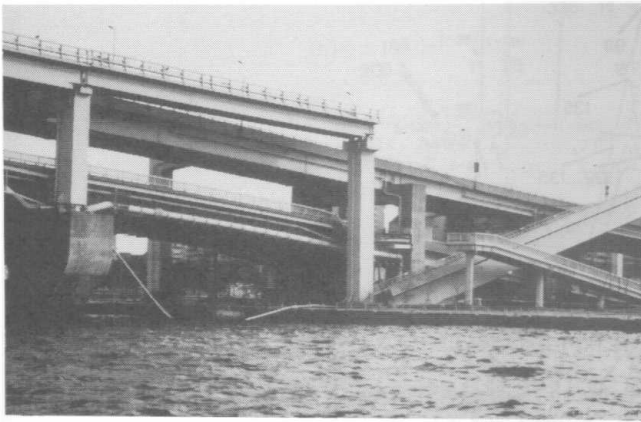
Bridge girder dropped due to ground displacement (A in Figure 12)
